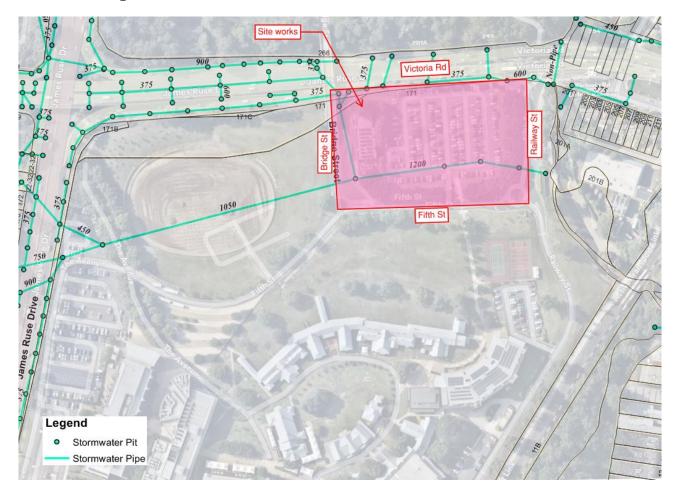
City of Parramatta Council stormwater drainage system diagram.
